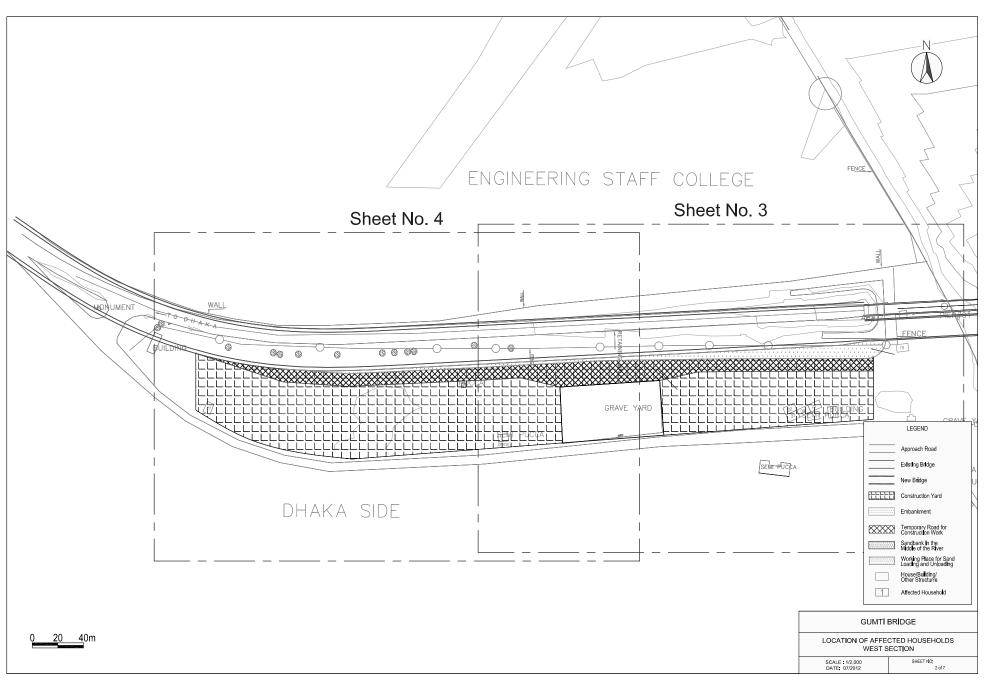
Location of Affected Households West Section (Sheet No.2)
